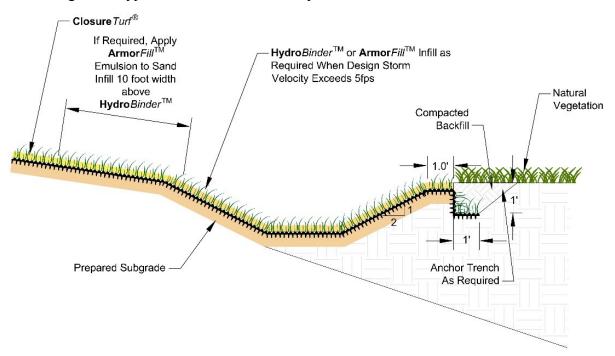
Typical ClosureTurf® with HydroBinder® Infilled Ditch Section
